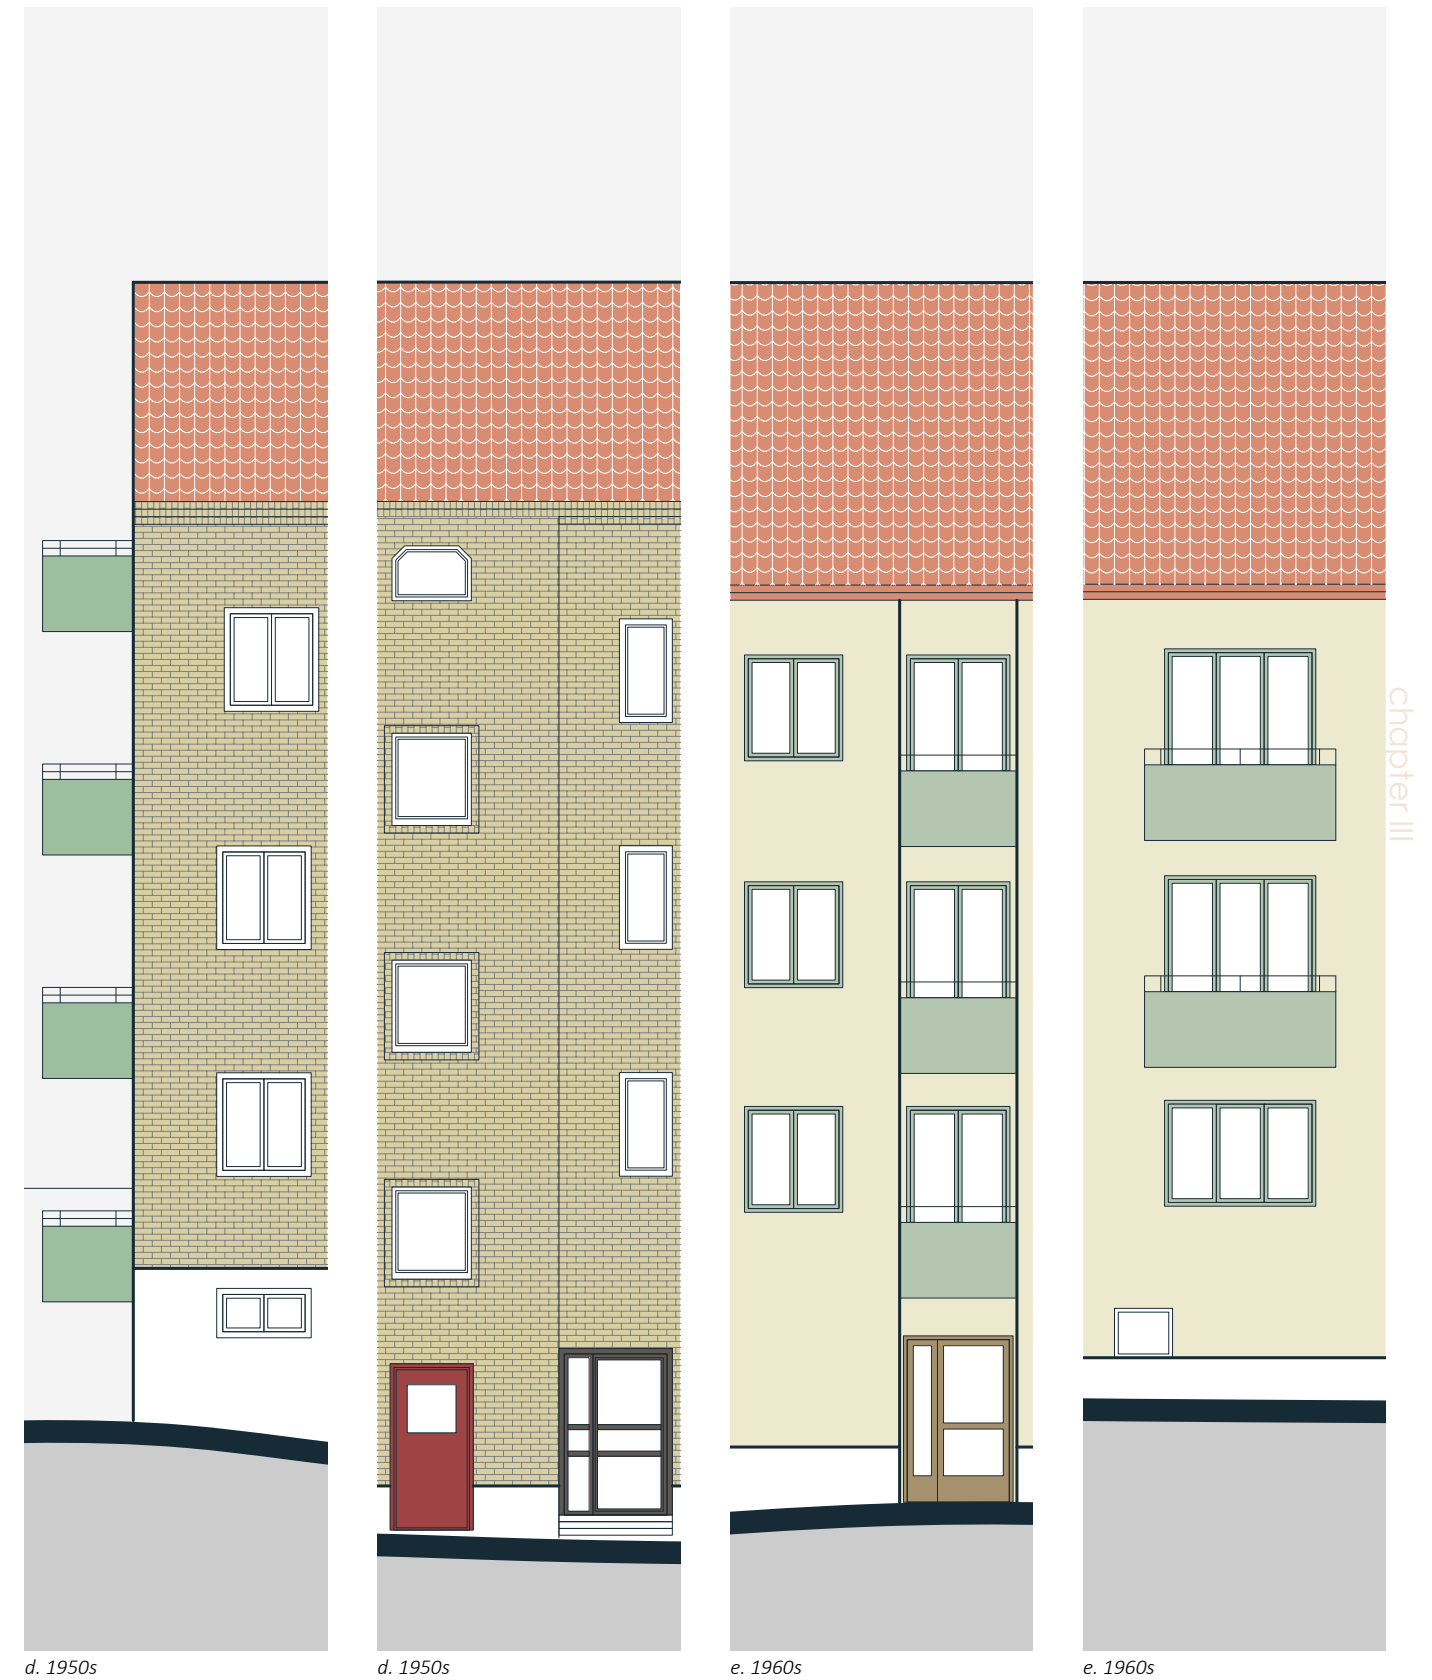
Detailed Facade Drawing of Mid-twentieth Buildings 1:100
